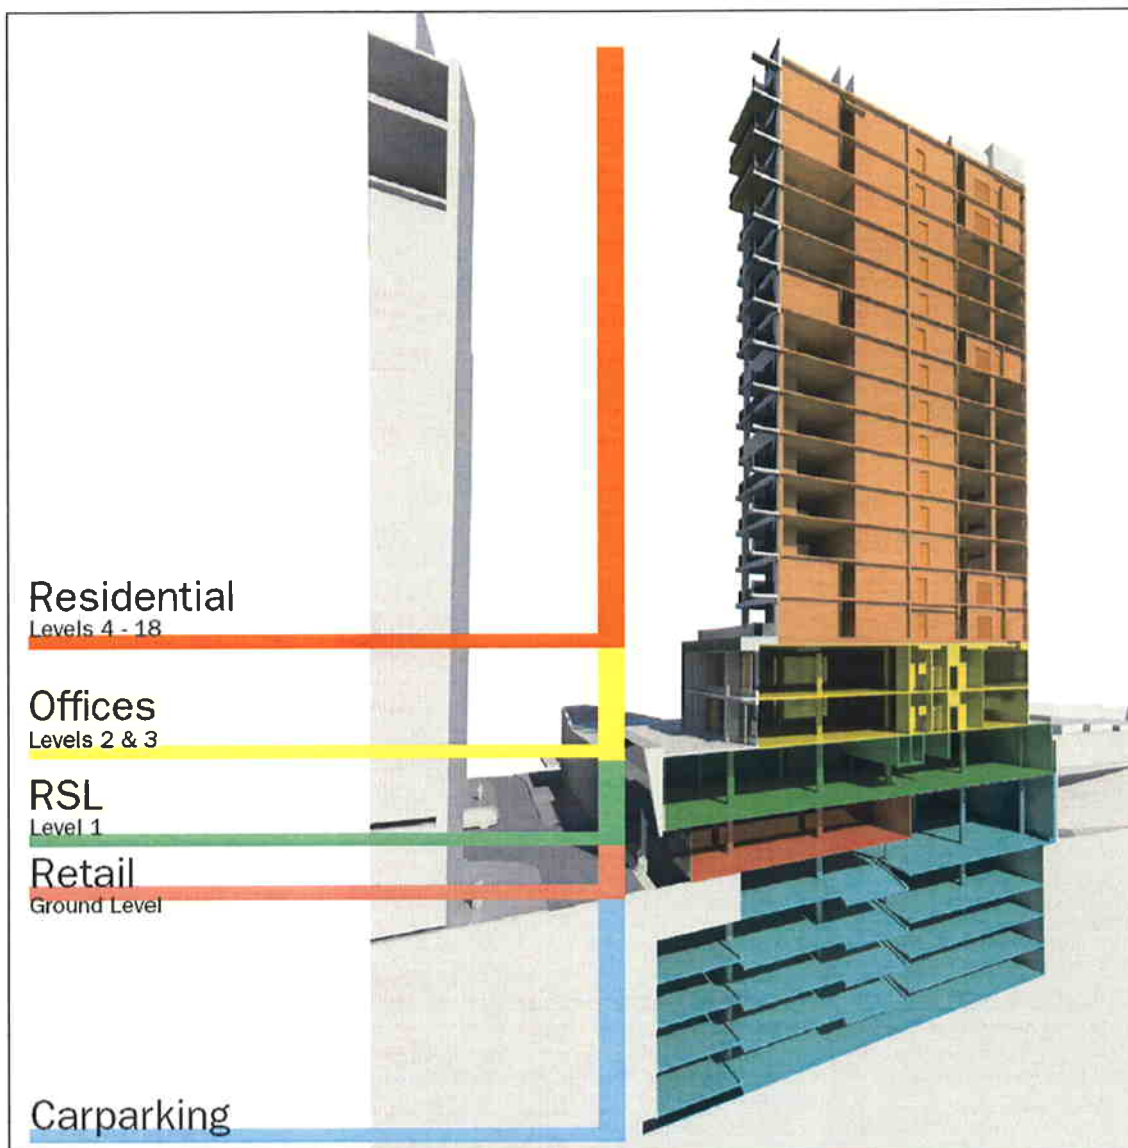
3-D cross section of proposal illustrating basement car parking (viewed from west)
